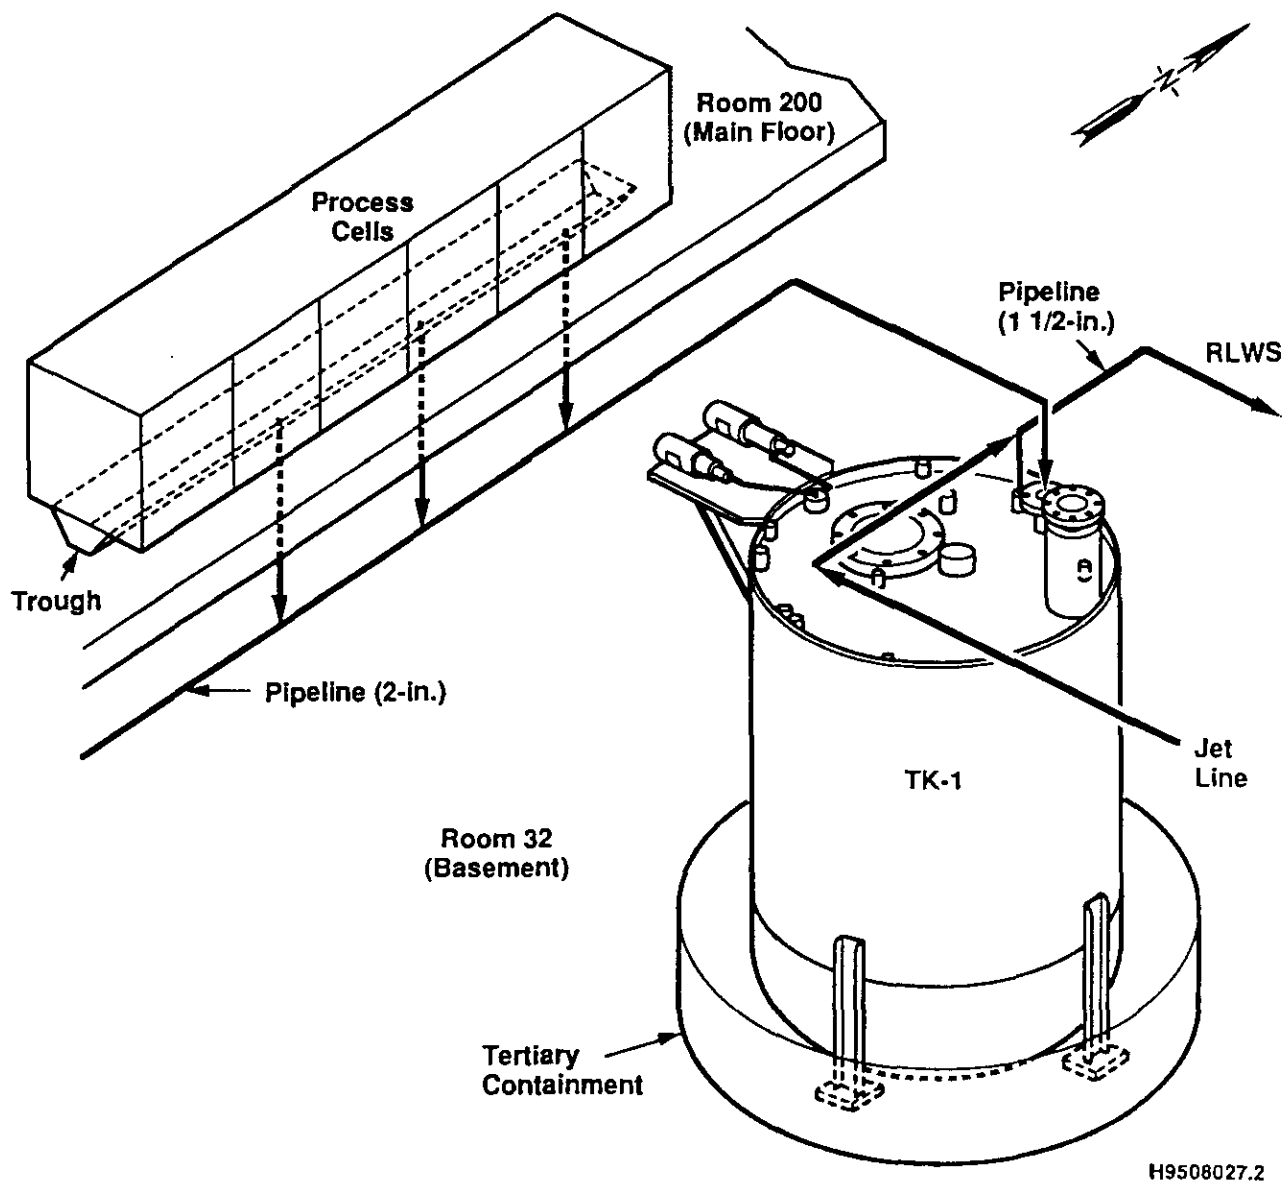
Shielded Analytical Laboratory Tank and Ancillary Piping.
